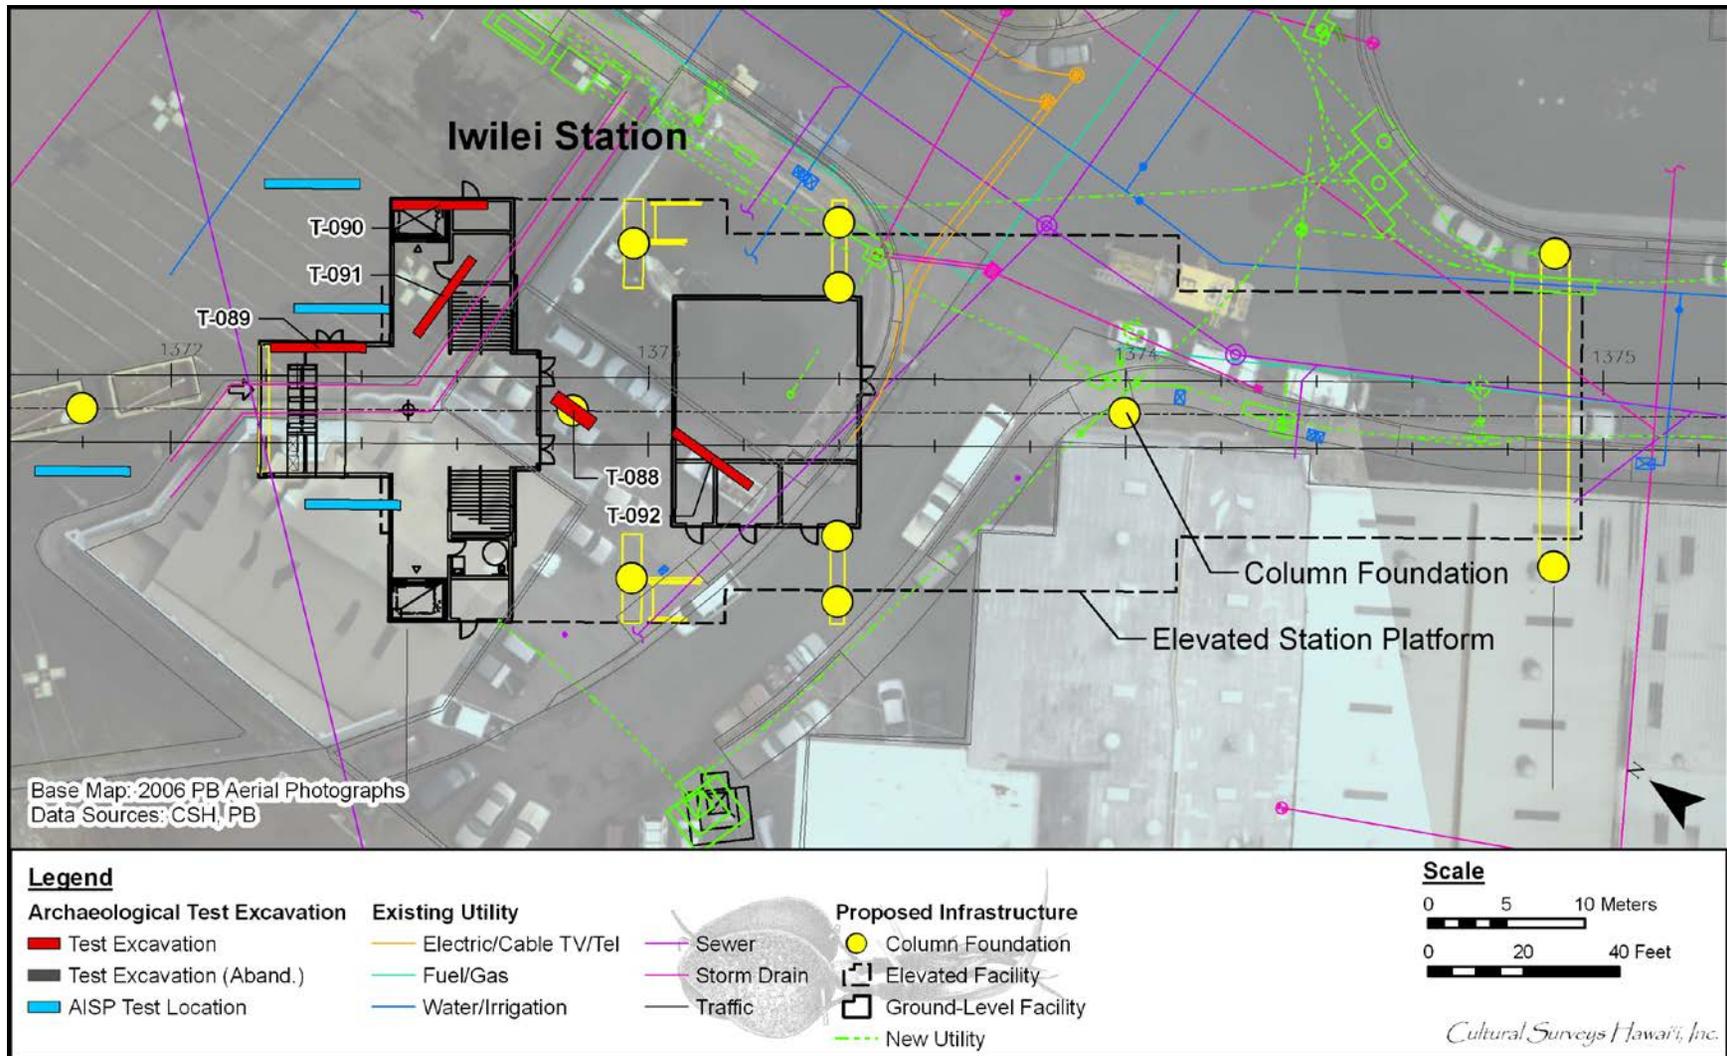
Iwilei Station, detail of column foundation layout showing locations of proposed AISP and actual AIS test excavations
